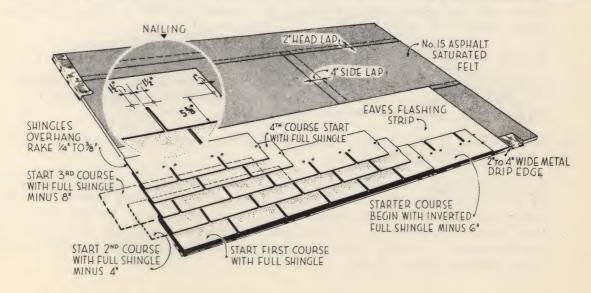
Three-tab square butt strips. Cutouts break joints in thirds.
